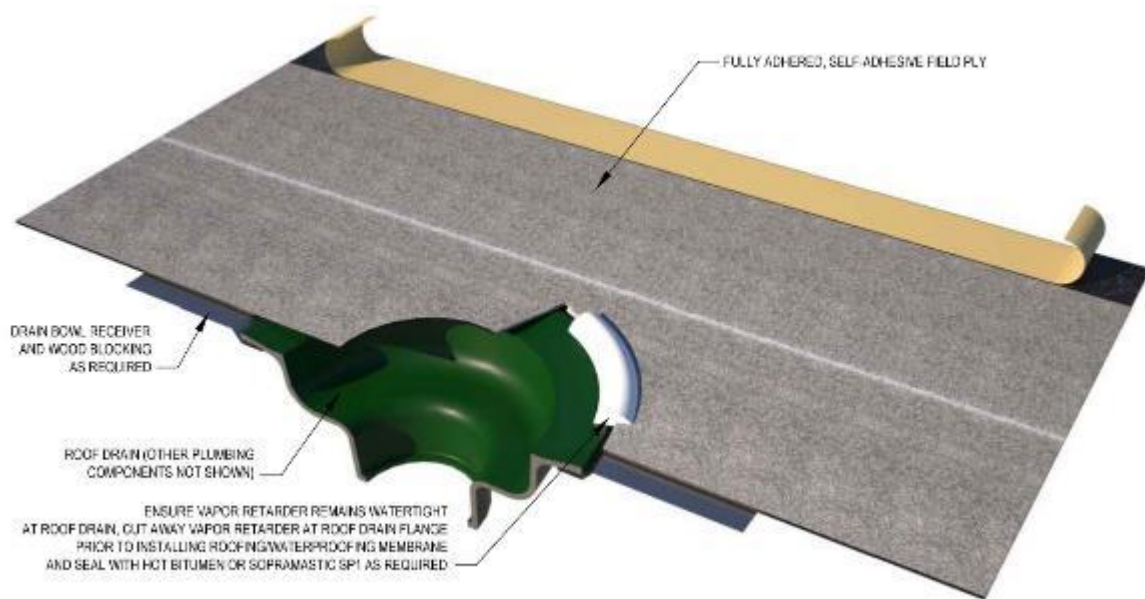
Fully Adhered, Self-Adhesive Vapor Retarder at Roof Drain
